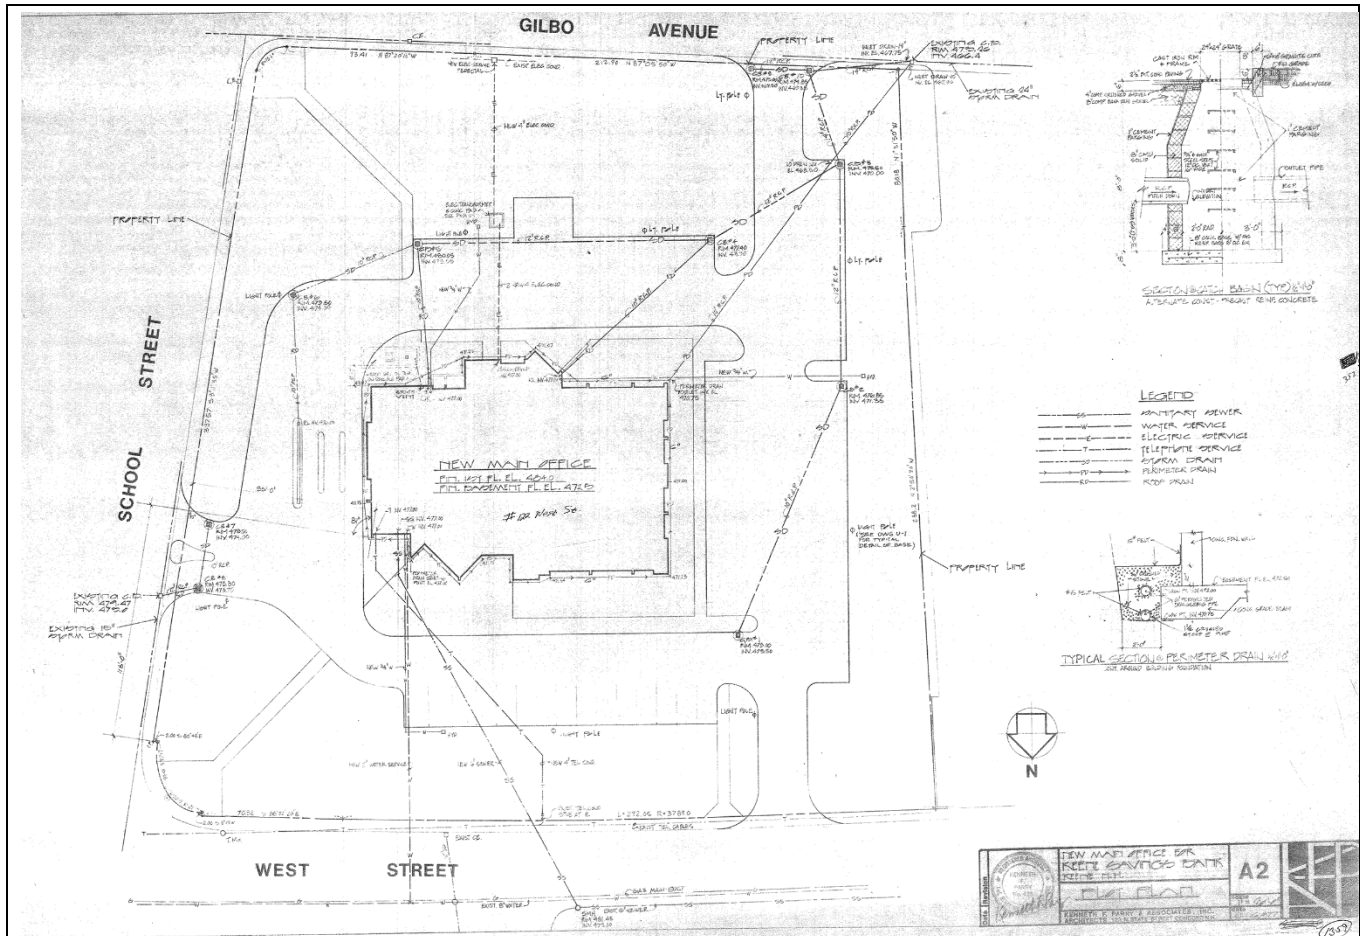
122 West St-2024-2.jpg	Date	June 19, 2024	Direction	South
